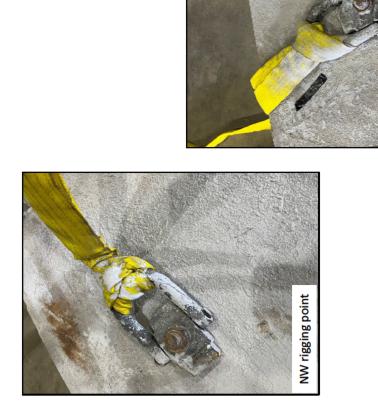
Images showing the girth hitch configuration of the rigging slings on the pivot lifting plates for Slab 4. Images taken after the suspended Slab 4 pieces were lowered to the strong floor.
